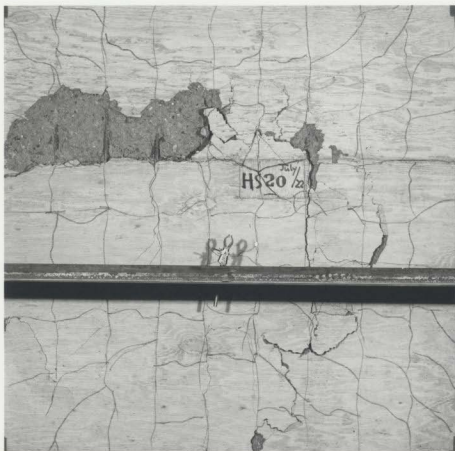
The failure pattern of Slab HS20 (U-stirrup shear reinforcement) in Series II
